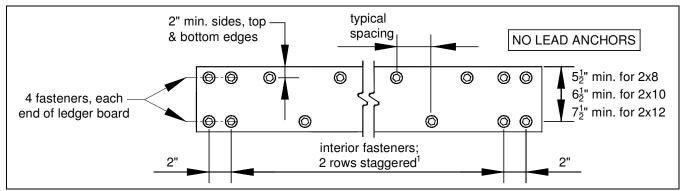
LEDGER BOARD FASTENER SPACING AND CLEARANCES
